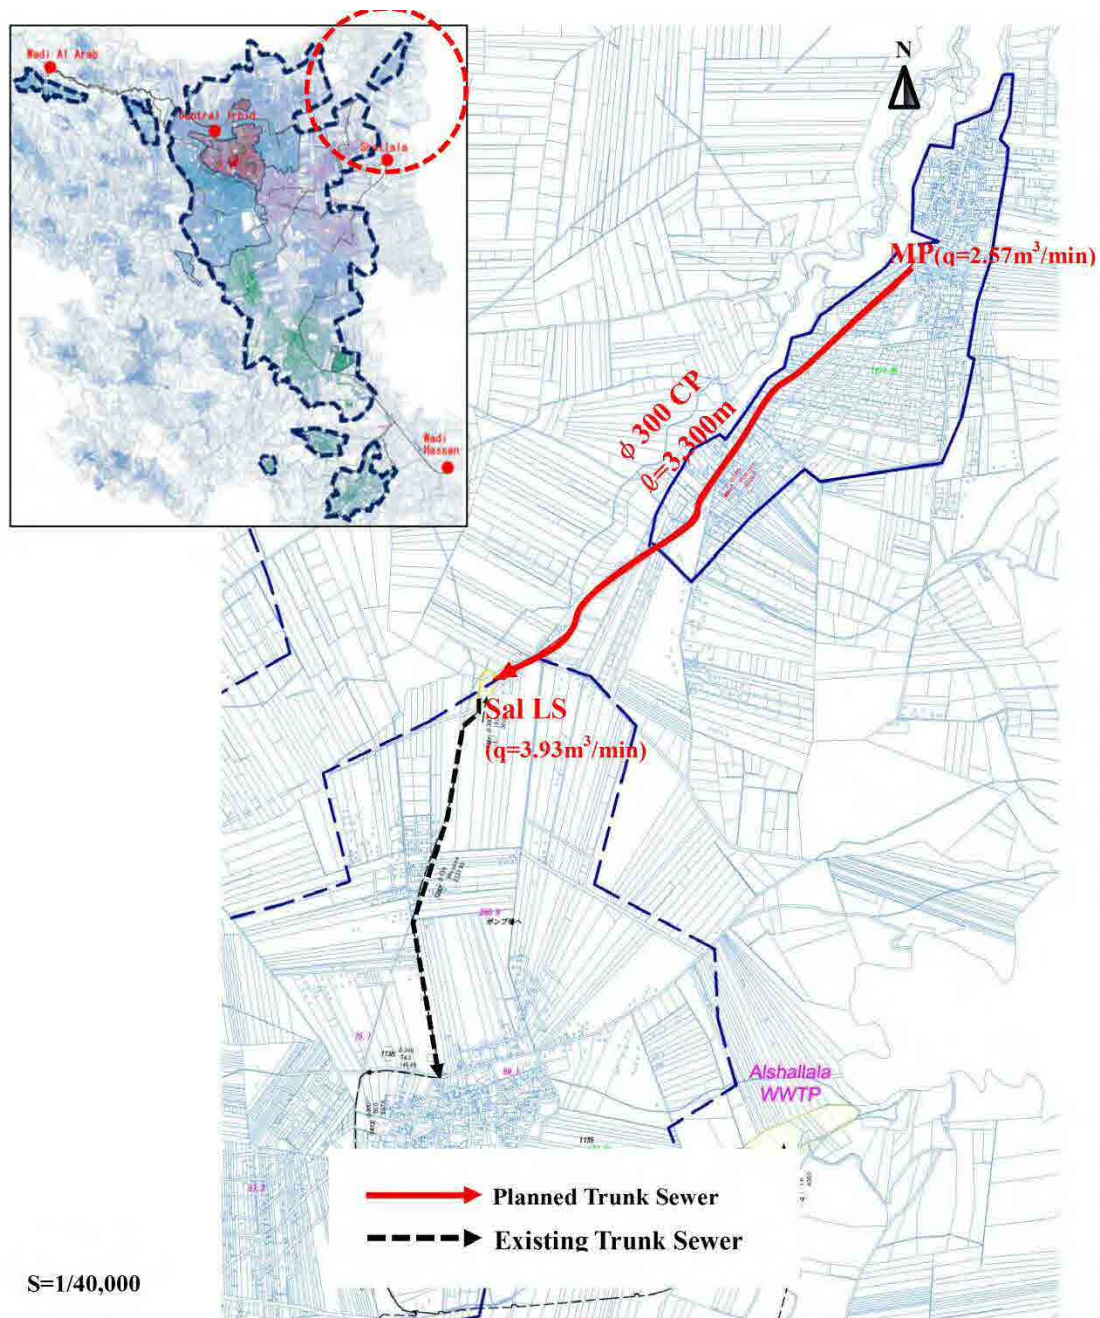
New Trunk Sewers in Shallala SWD (1)
